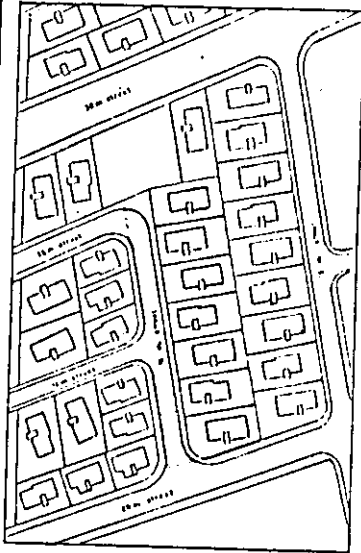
EXISTING LAND-SUBDIVISION LAYOUT.
